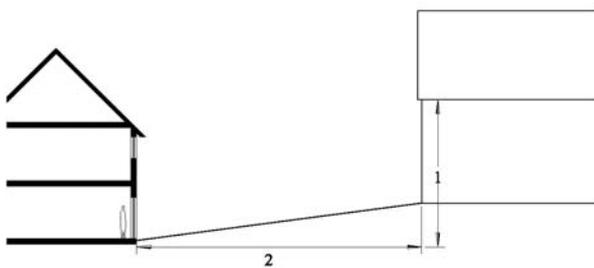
The distance between habitable room windows and an elevated blank wall must be minimum 2 times of the height of the wall plus the level difference.
